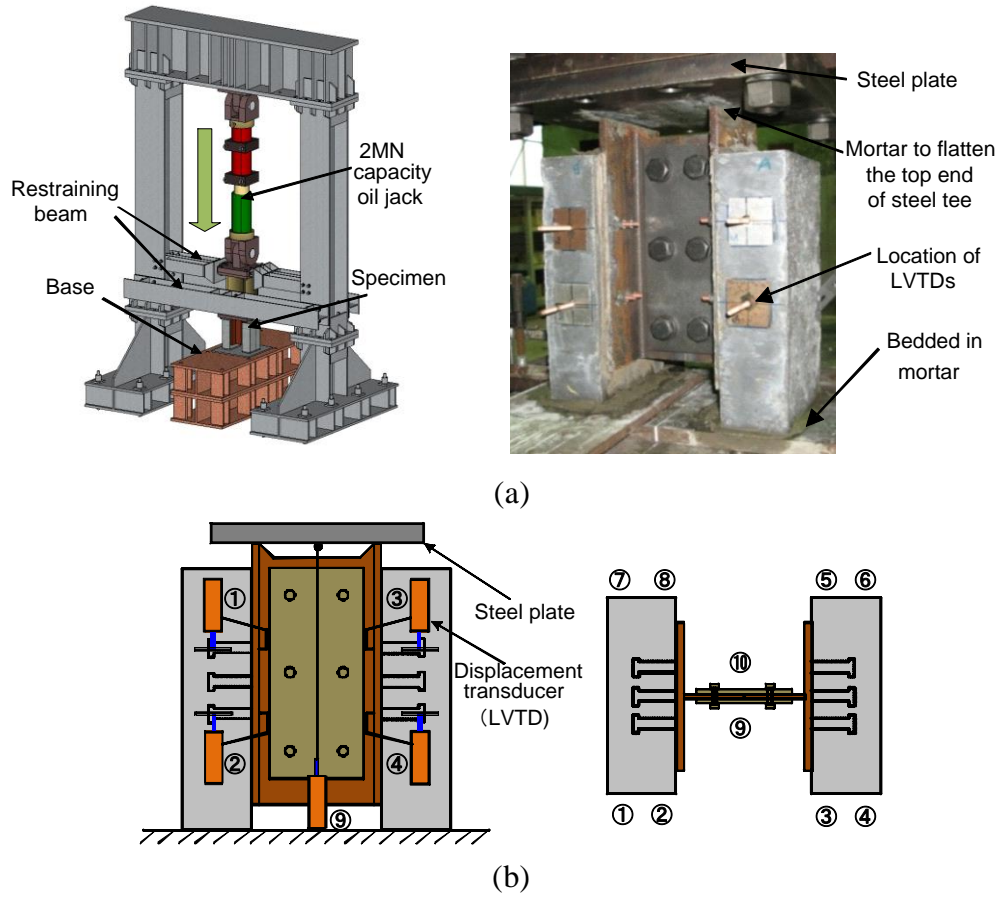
Setup for push-out tests (a) Loading frame and specimen;
